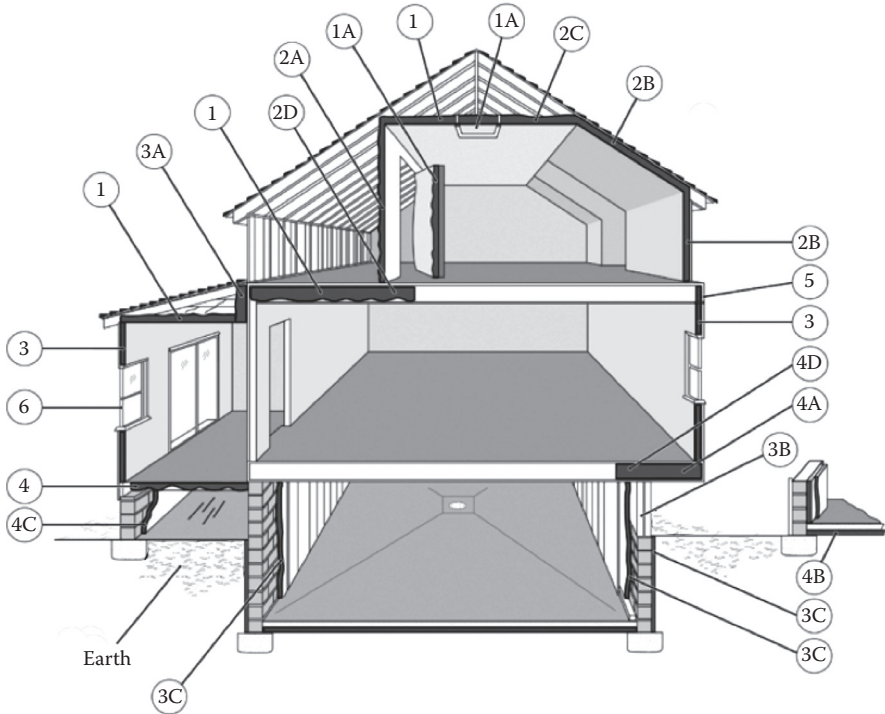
Locations where insulation is needed. Insulation fact sheet (insulating a new house) from Oak Ridge National Laboratory, http://www.ornl.gov/sci/roofs+walls/insulation/ins_05.html. 1. In unfinished attic spaces, insulate between and over the floor joists to seal off living spaces below.^a 1A. Attic access door. 2. In finished attic rooms with or without dormer, insulate. 2A. Between the studs of “knee” walls. 2B. Between the studs and rafters of exterior walls and roof. 2C. Ceilings with cold spaces above. 2D. Extend insulation into joist space to reduce airflows. 3. All exterior walls, including 3A, walls between living spaces and unheated garages, shed roofs, or storage areas; 3B, foundation walls above ground level; 3C, foundation walls in heated basements, full wall, either interior or exterior.^b 4. Floors above cold spaces, such as vented crawl spaces and unheated garages. Also insulate 4A, any portion of the floor in a room that is cantilevered beyond the exterior wall below; 4B, slab floors built directly on the ground; 4C, as an alternative to floor insulation, foundation walls of unvented crawl spaces; 4D, extend insulation into joist space to reduce airflows. 5. Band joists. 6. Replacement or storm windows and caulk and seal around all windows and doors.
